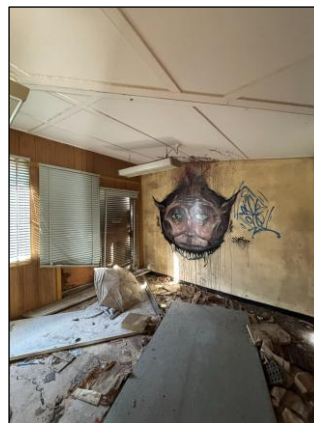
Interior northern end with non-significant wall linings and aluminium glazed doors (Apr 26).
